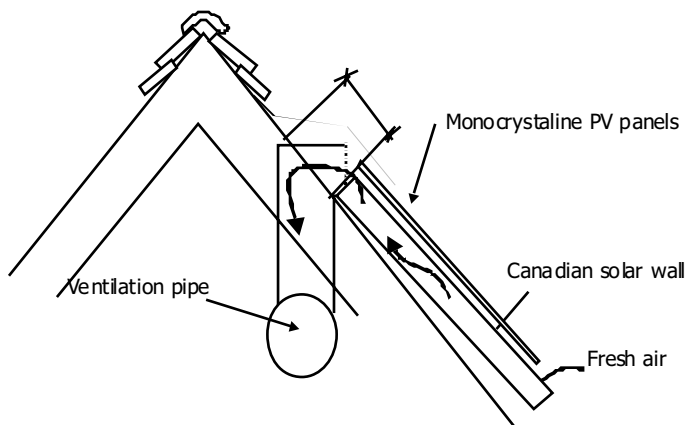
cross-section of the arrangement for pre-heating the ventilating air in the cavity between photovoltaic panel and roof
